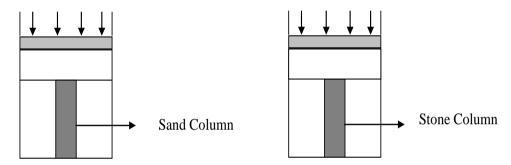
Schematic diagrams showing the loading condition on sand and stone column
